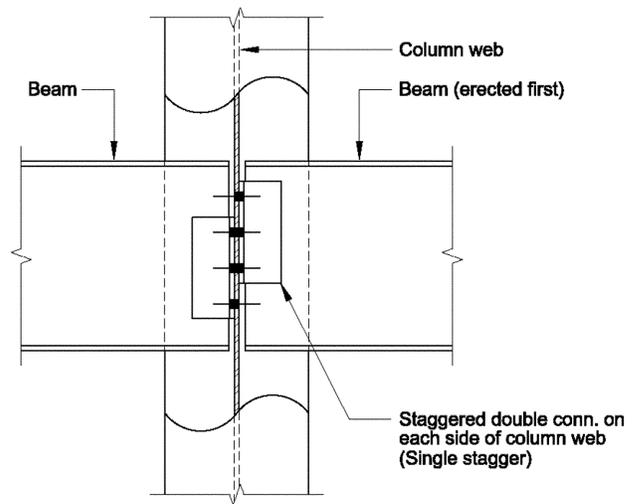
Single-staggered stabilization of beam’s top flange.
